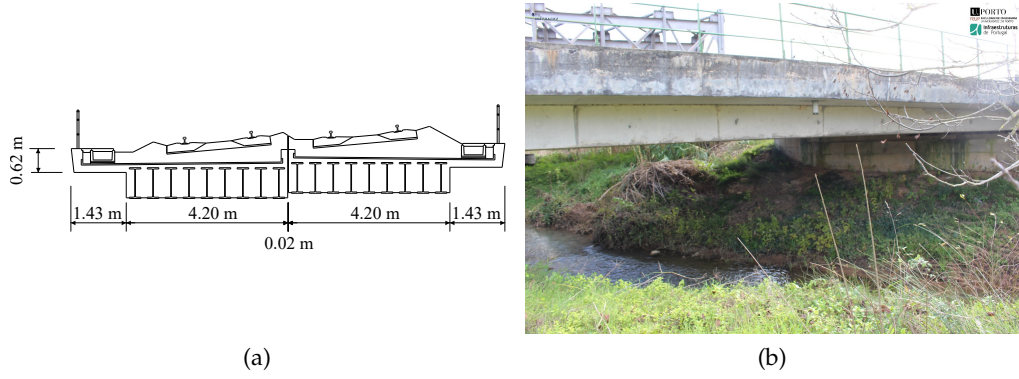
Melga bridge. (a) cross-section (unit: m); (b) view of the deck.
